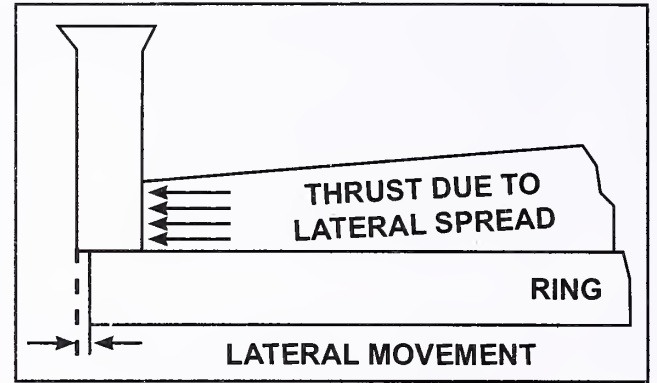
Cracks Between the Arch Ring and the spandrel or Parapet Wall
